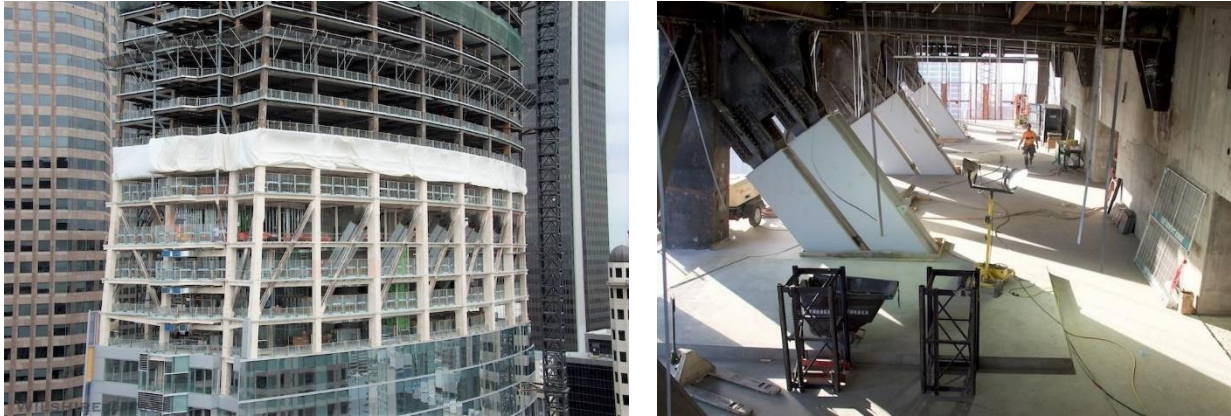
Steel belt trusses and BRBs between the 28th and 31st Floor of Wilshire Grand Tower.
